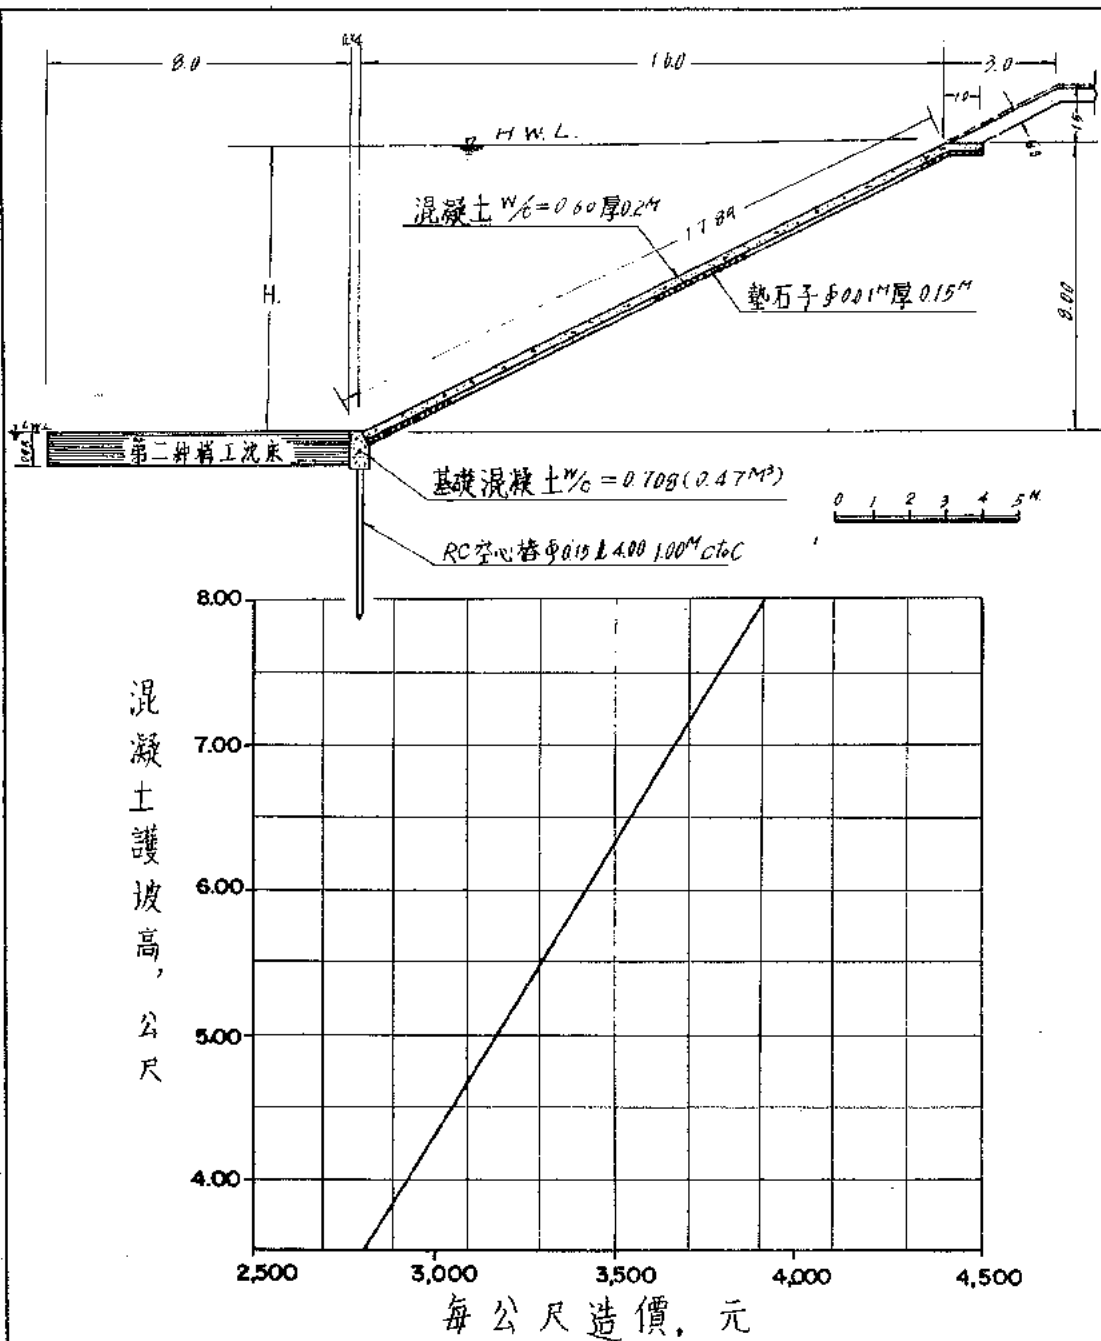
TYPICAL SECTION OF HEIGHTENING OF CONCRETE DIKE
